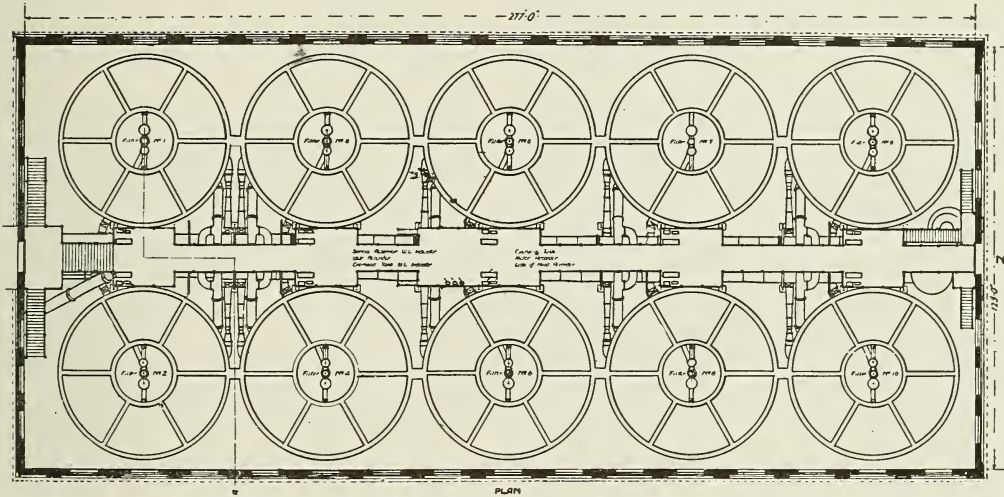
Toronto Filtration Plant—General Arrangement of Pipes in Filter House.
